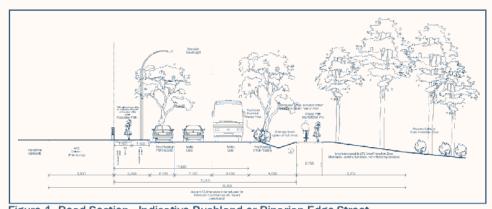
Road Section - Indicative Bushland or Riparian Edge Street.
